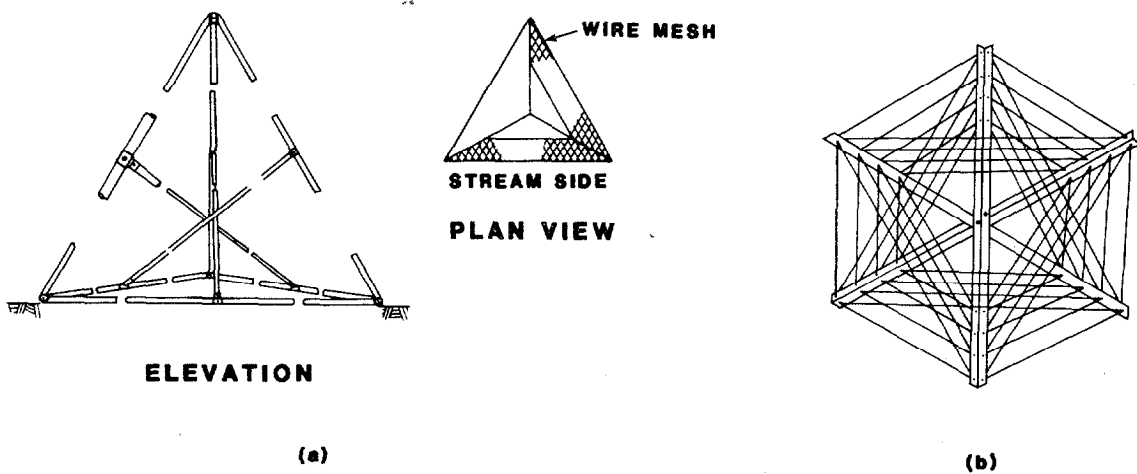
STEEL JACK AND TETRAHEDRON DETAILS.
